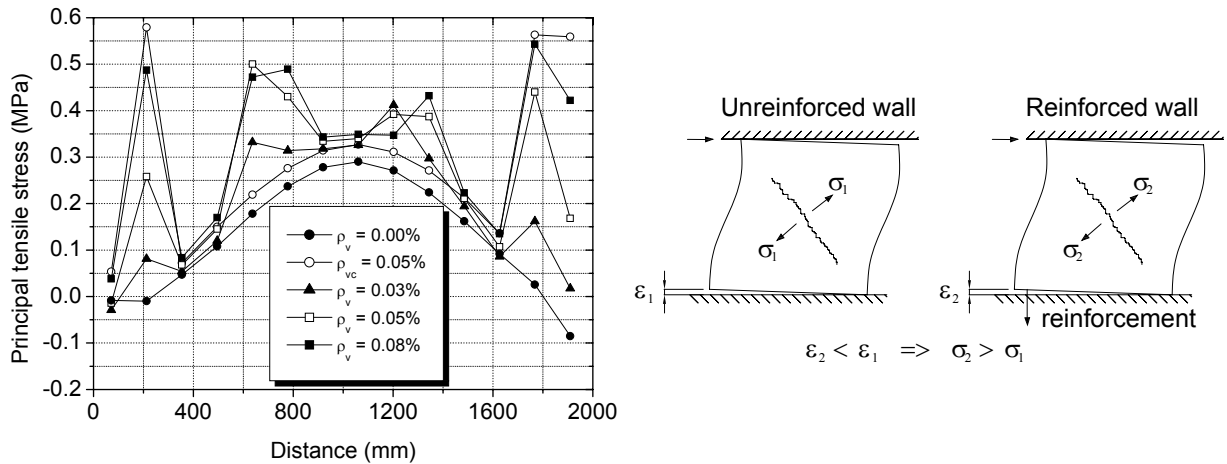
Premature cracking in masonry walls with vertical reinforcements.
